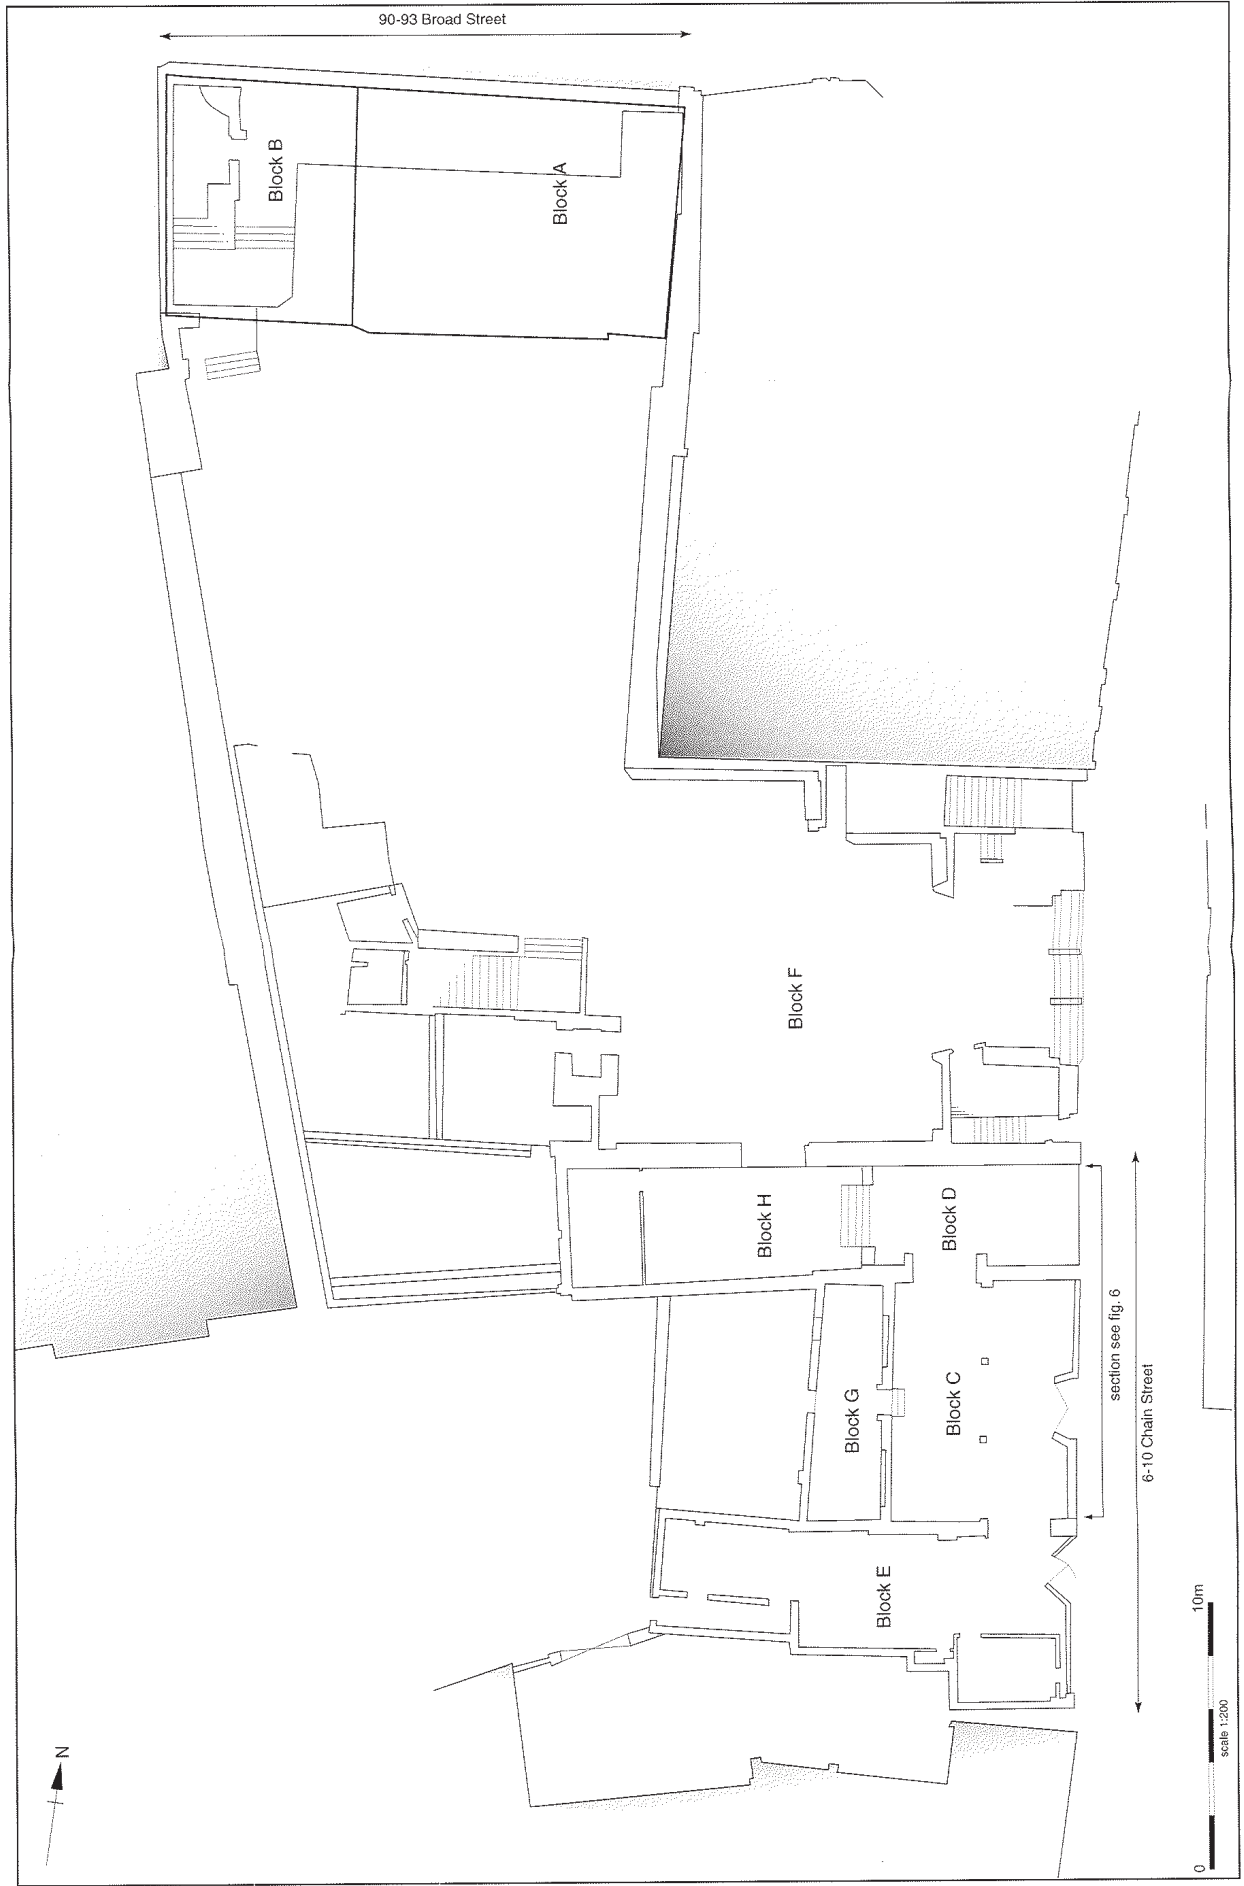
90-93 Broad Street, Reading, Ground Floor
